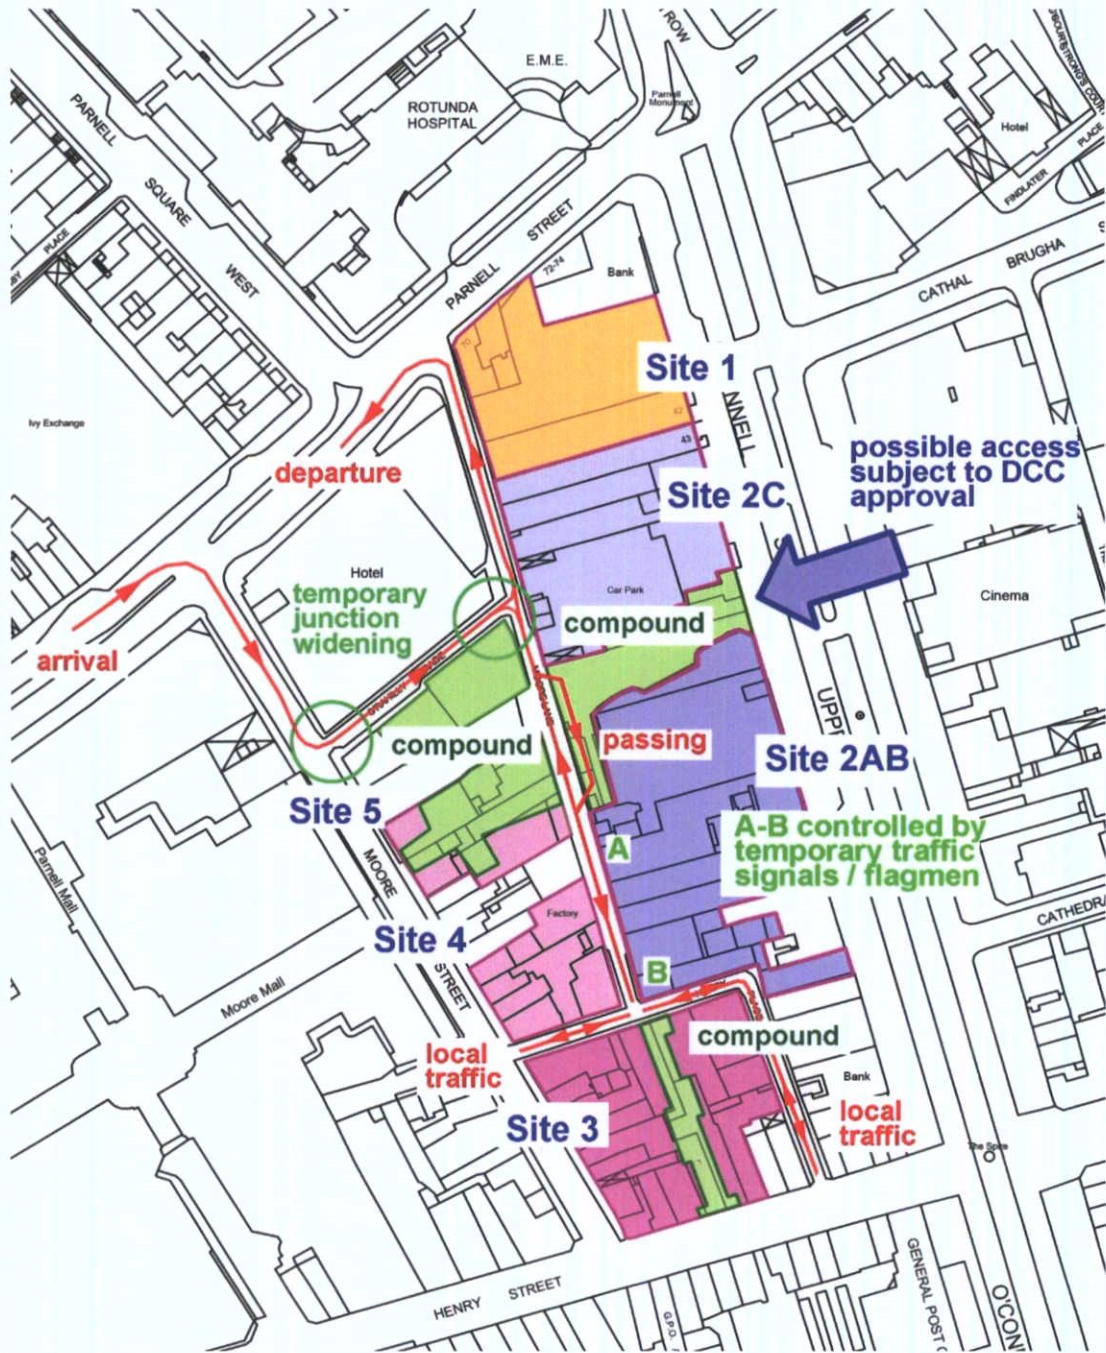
Local Traffic Management During Construction of Site 2 and No. 61 O'Connell Street Upper.
